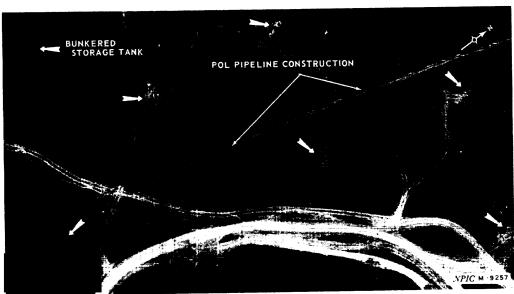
POL PIPELINE CONSTRUCTION, AN BO STORAGE AREA SOUTH, NORTH VIETNAM
